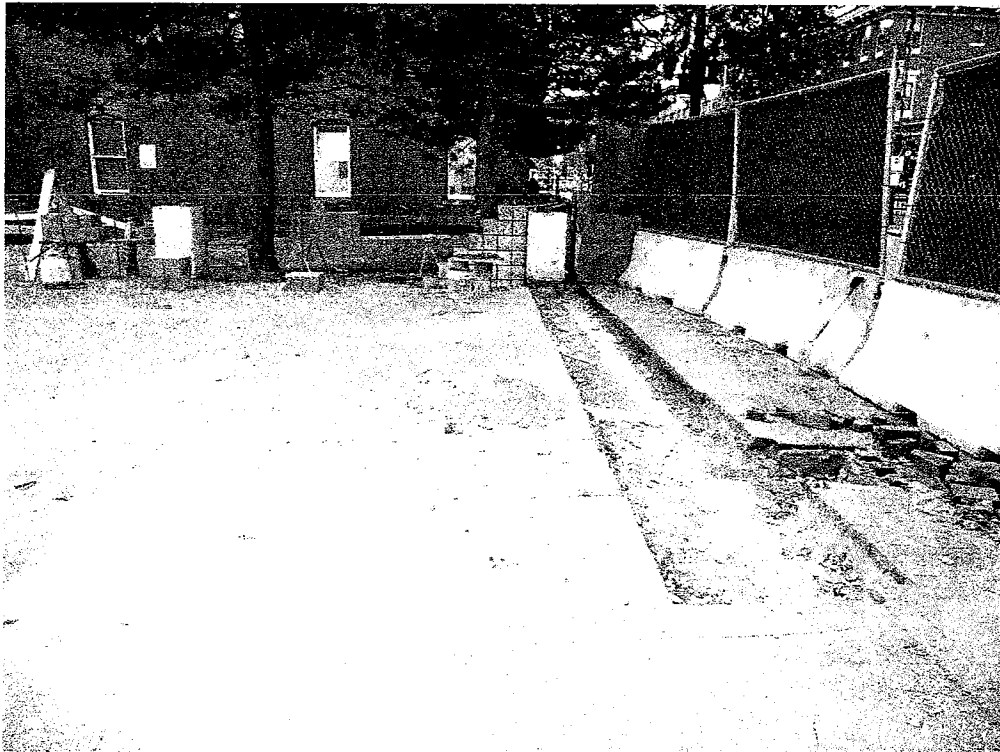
Exterior site landscape wall to be supported on existing building foundation
